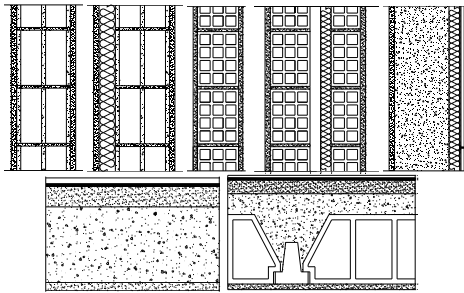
Vertical cross-section of the construction solutions of the buildings walls and floors
